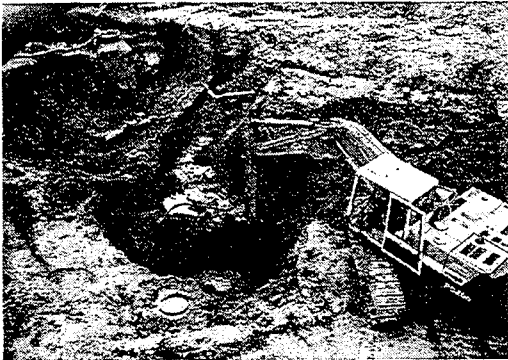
Offset of a Sewage Pipe (Point H, refer to Fig. 3)
